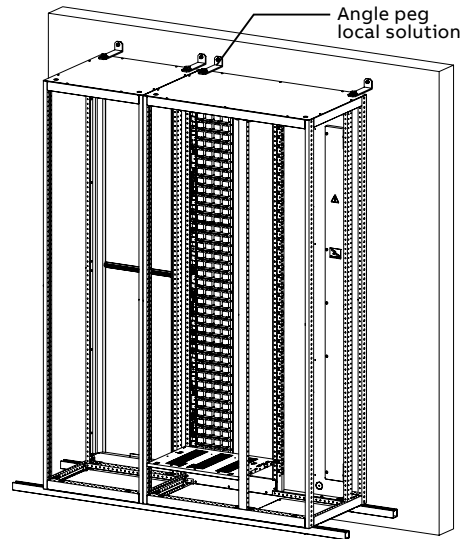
Fastening to foundation – UNISTRUT channel / each section fixed in 4 points
